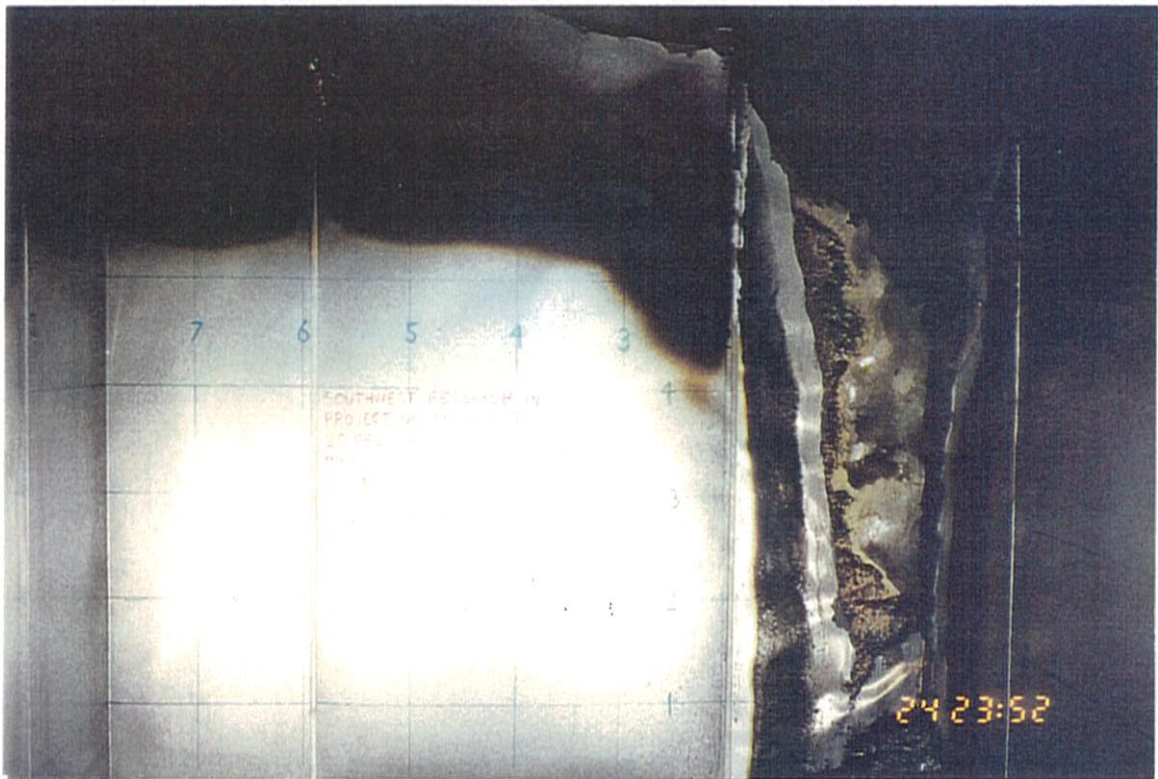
Room Interior Showing Back Wall Burner Corner.
